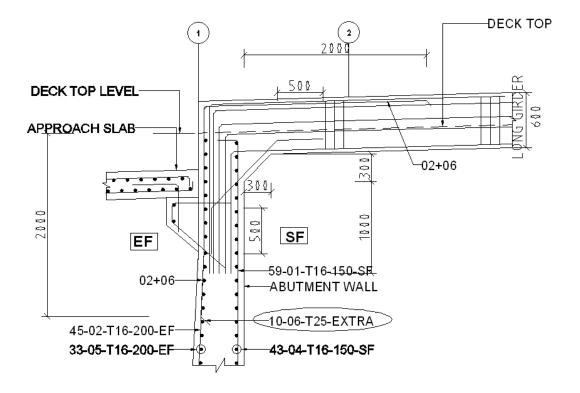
Reinforcement details at the monolithic connection between abutment wall and longitudinal main girder
